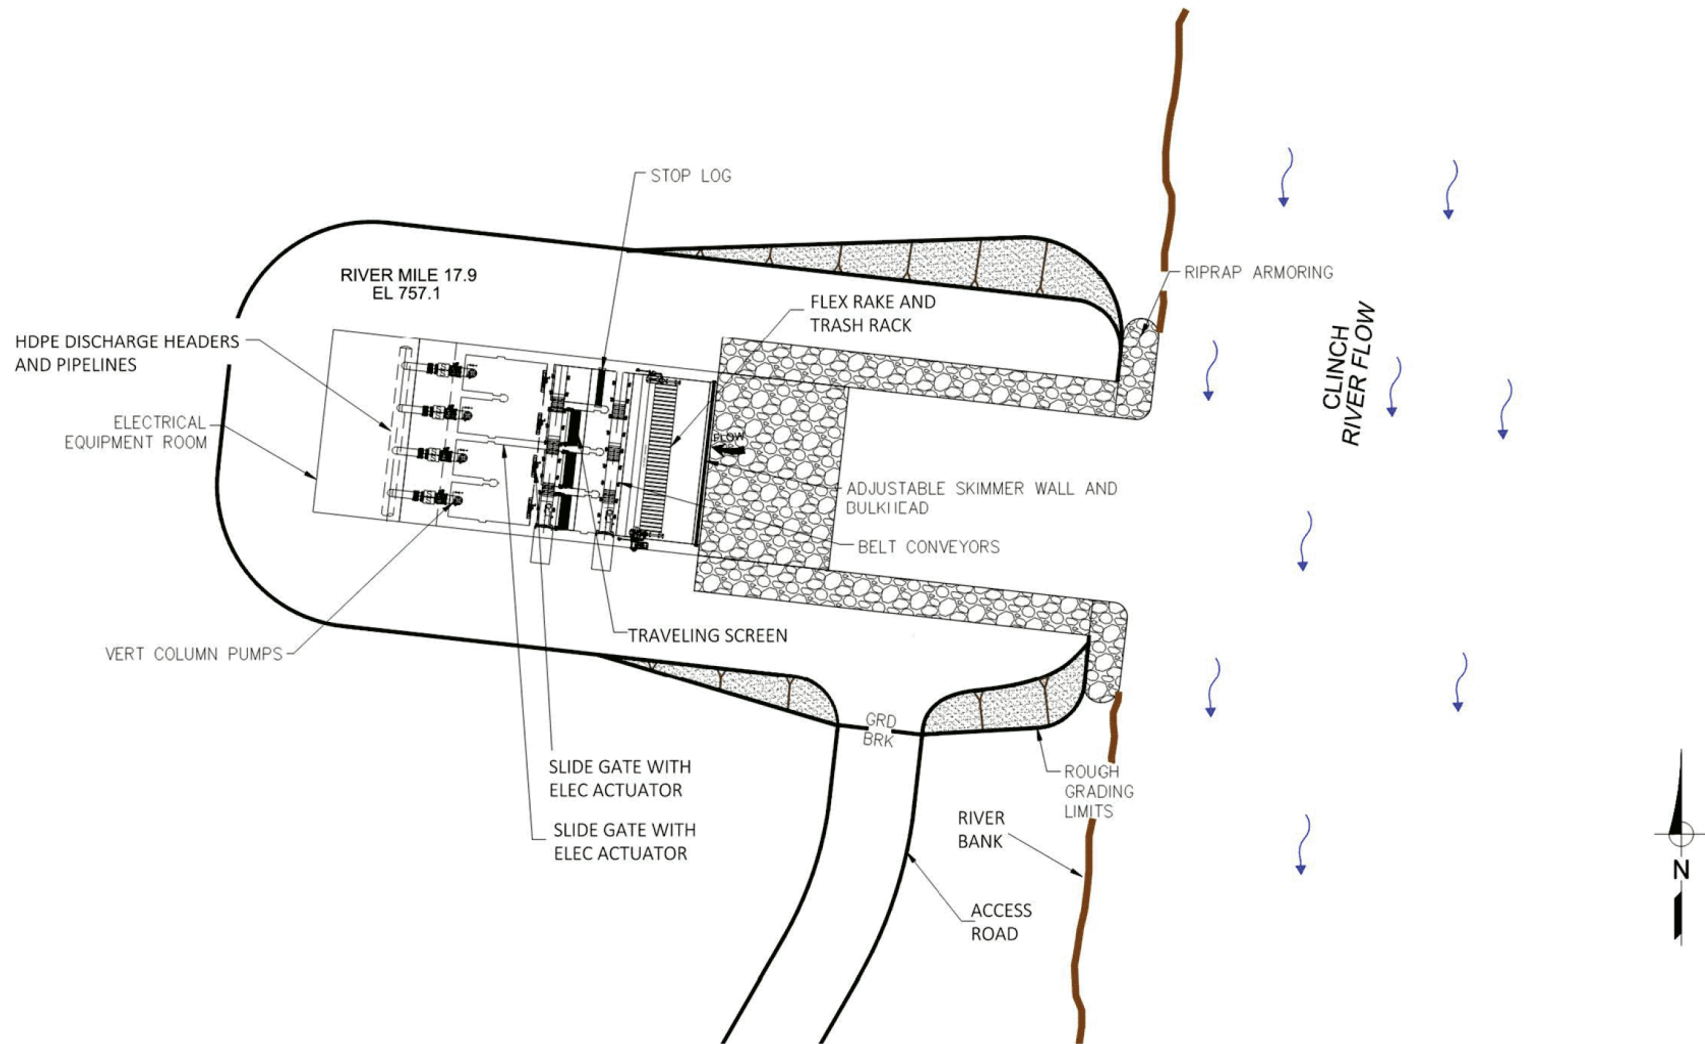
Recessed Intake Alternative Structure Plan
